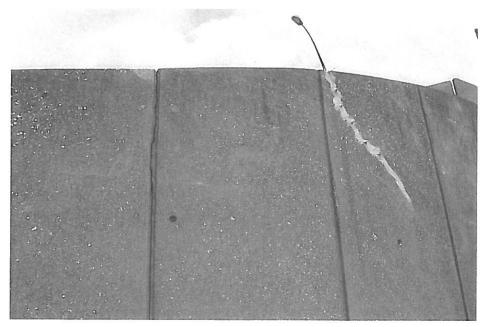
South Marginal Road bridge structure (Memorial Shoreway) – Northwest wing wall
